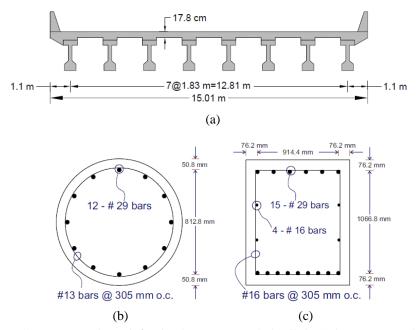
Concrete member reinforcing layout (a) Deck detail (b) Column (c) Bent beam
